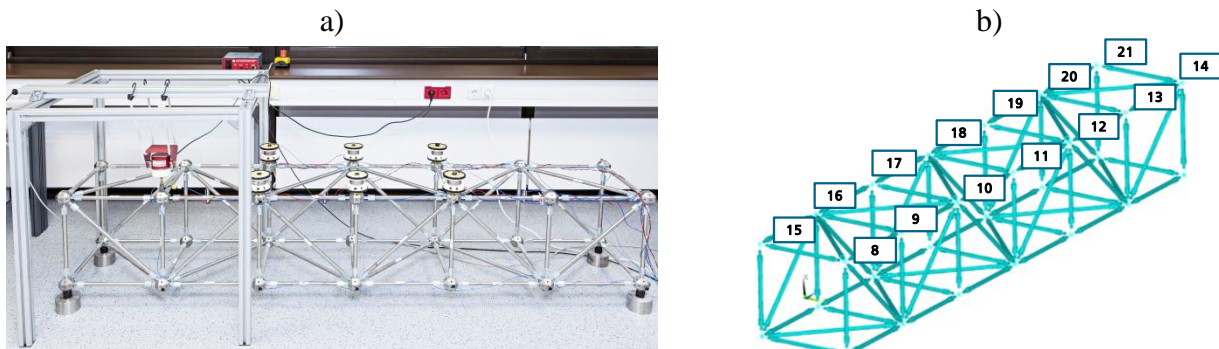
a) Laboratory six cells truss structure b) FEM model of the six cells truss structure
